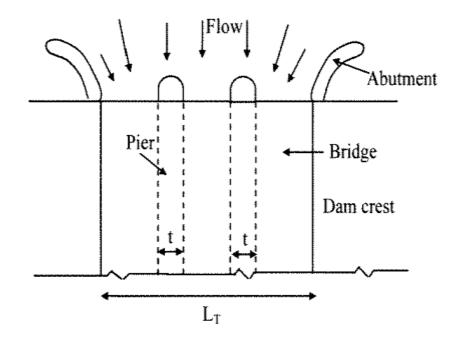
Plan View of Spillway (Yanmaz, 2018)
